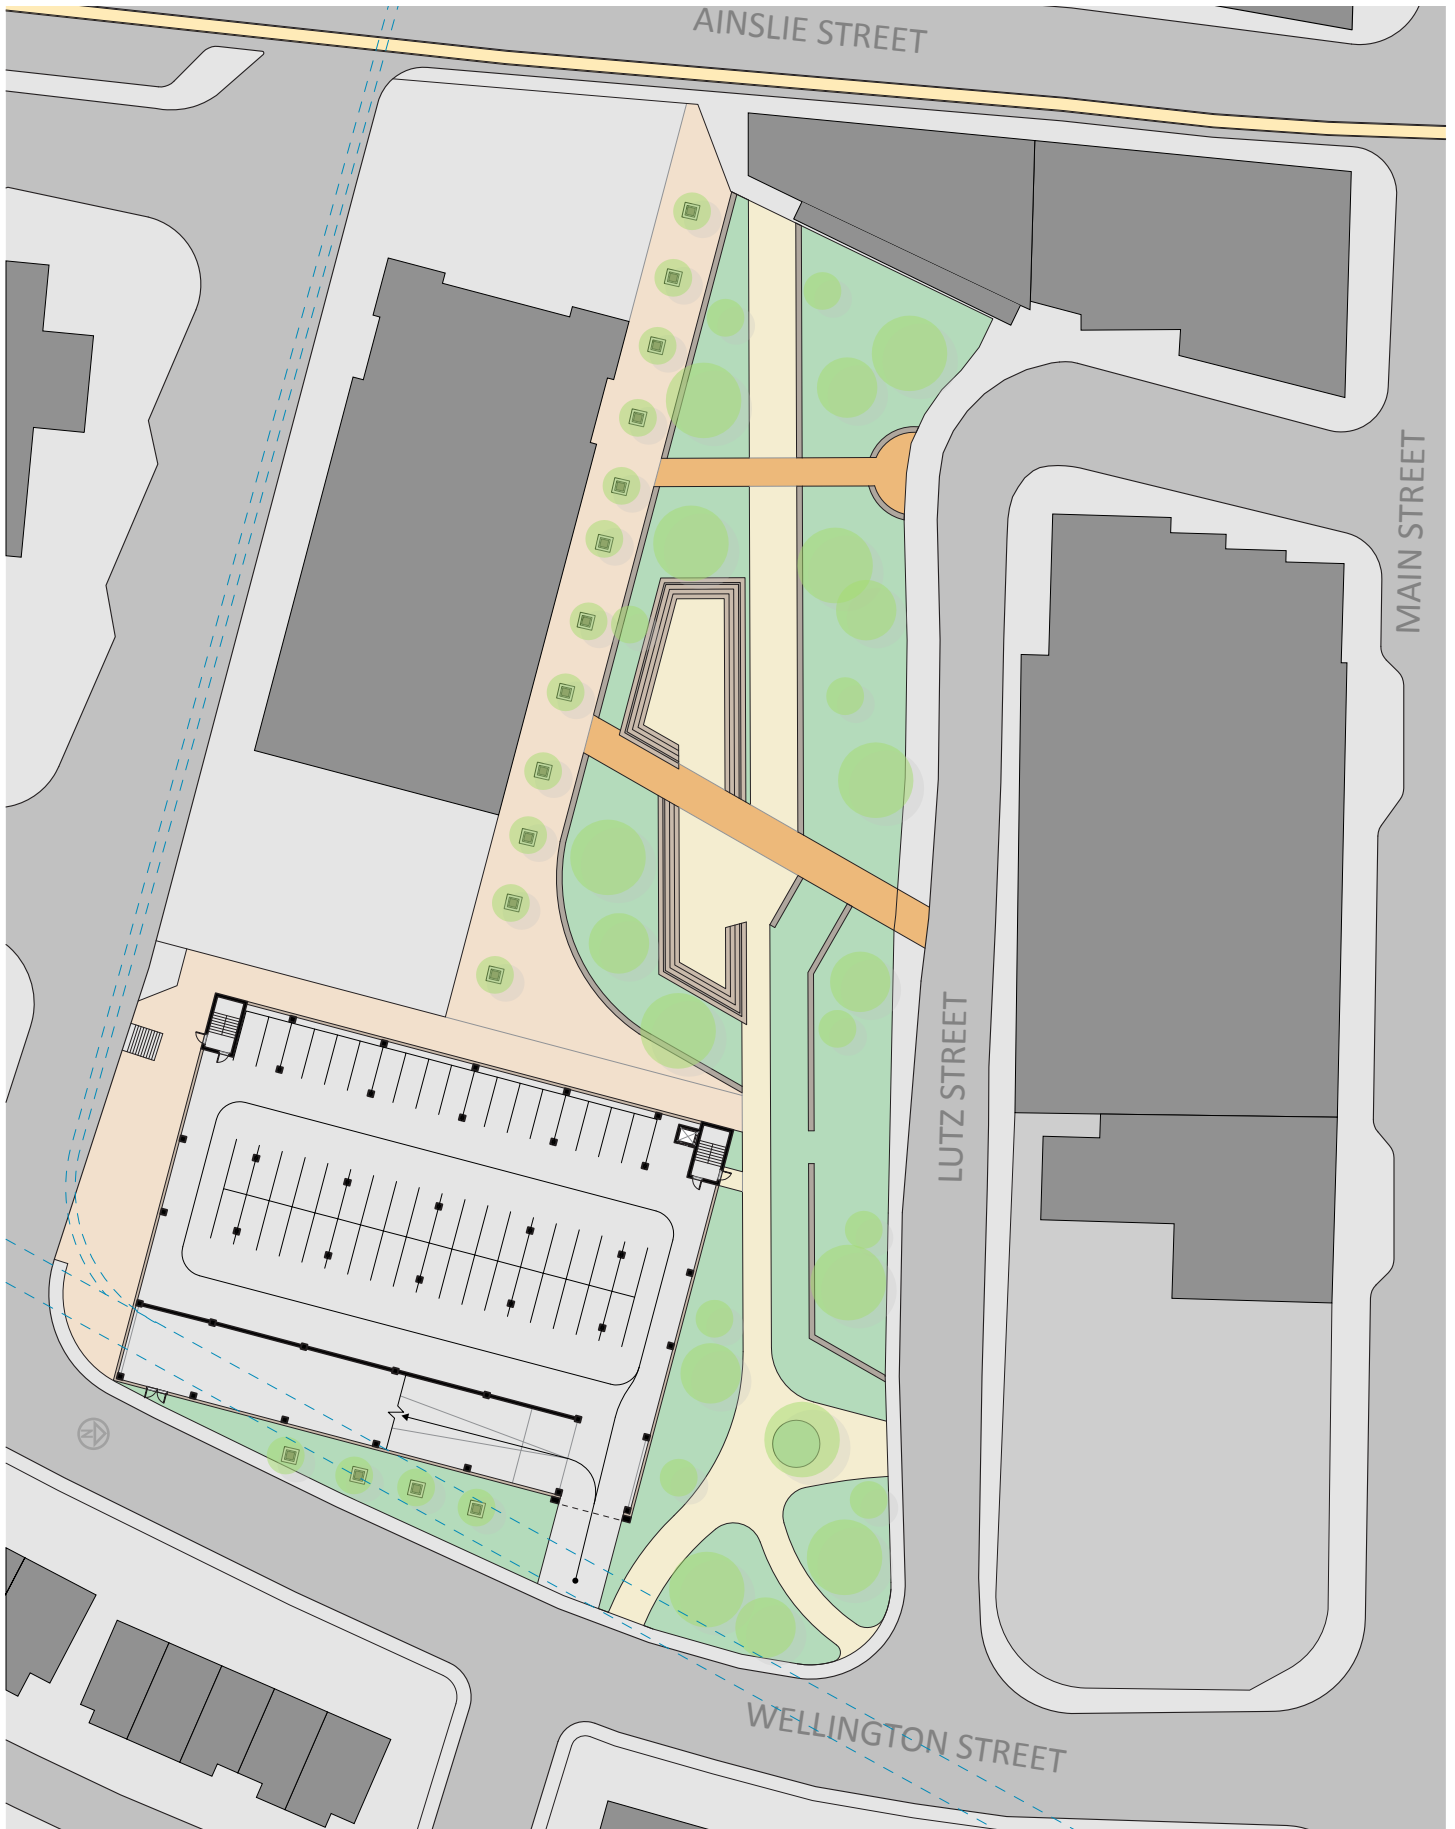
Siteplan showing interior distribution of the parking structure (1:800).
